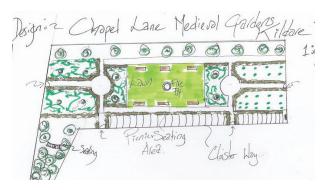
Proposed plan of medieval garden at base of cathedral wall.
